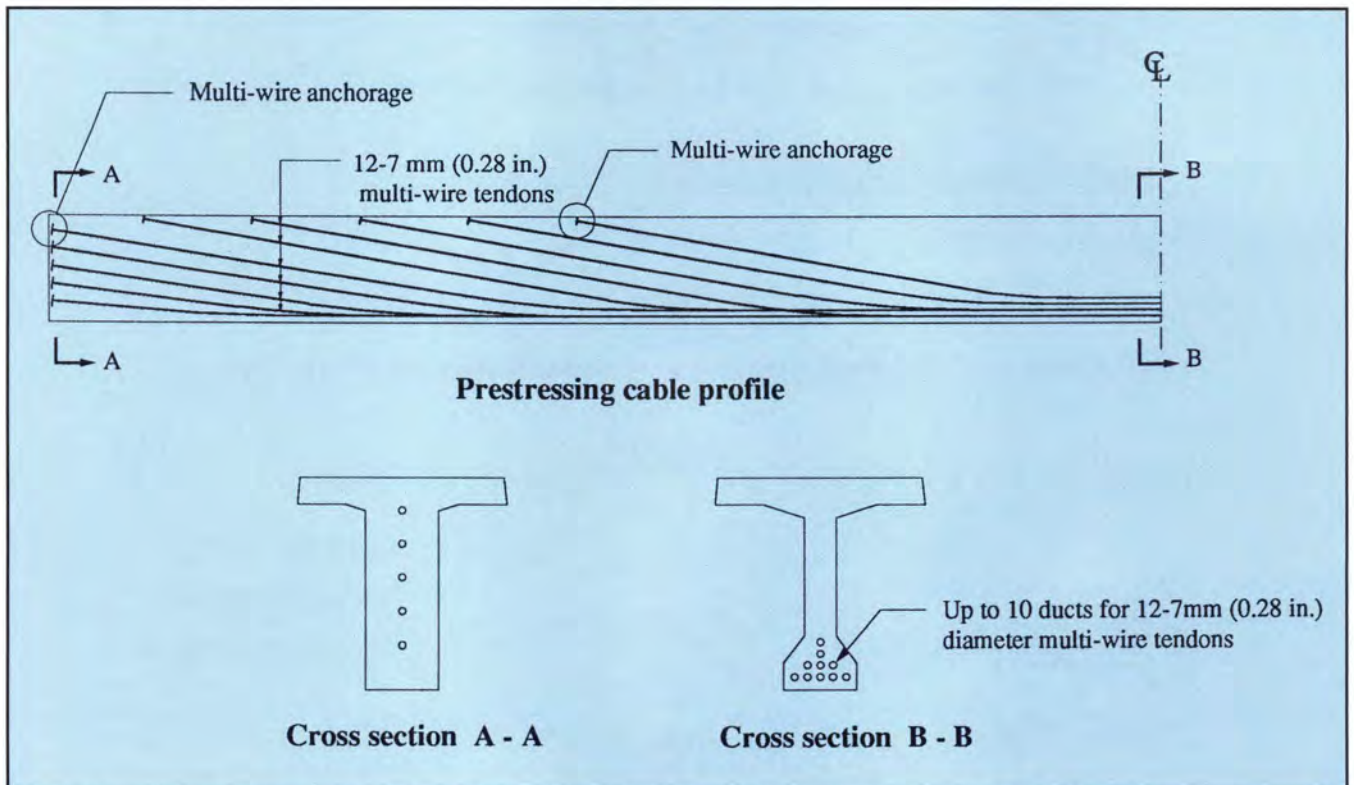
Prestressing cable profile for post-tensioned T-girders. Note: Standard span is 20 to 27 m (66 to 89 ft).
